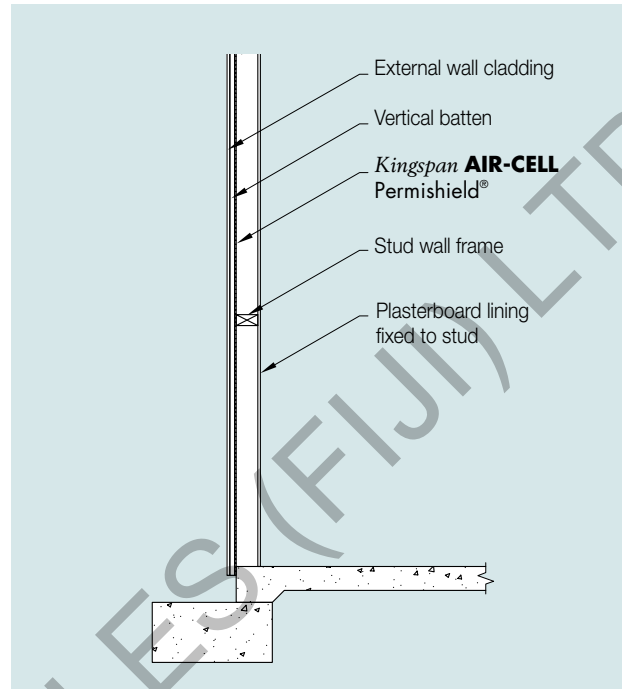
Side elevation of Kingspan AIR-CELL Permishield® on timber-framed wall
